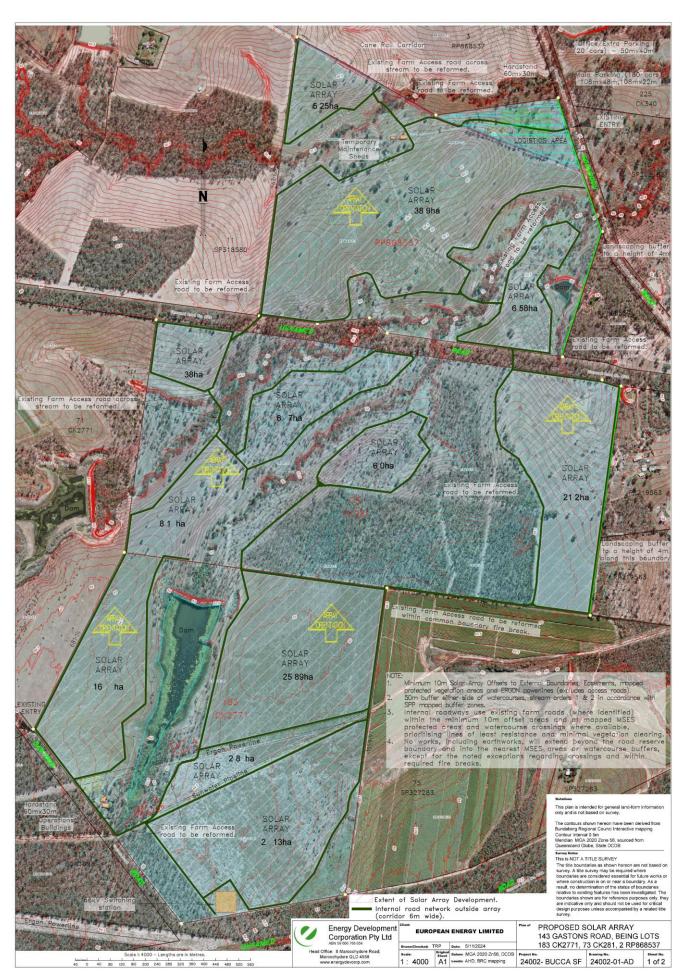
EDC Plan 24002-01-AD Proposed Solar Array Layout 2 of 3
